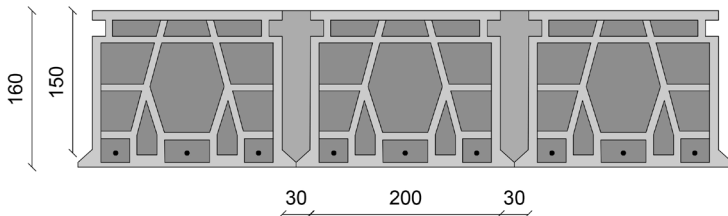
Lightweight ribbed one-way reinforced concrete slab representation.
